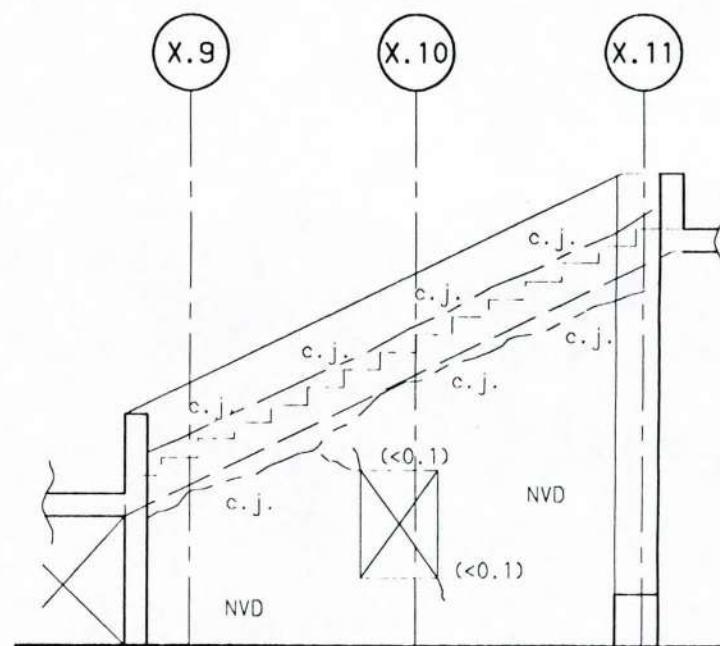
PERIMETER WALLS A, B & C TO PLANTER D
